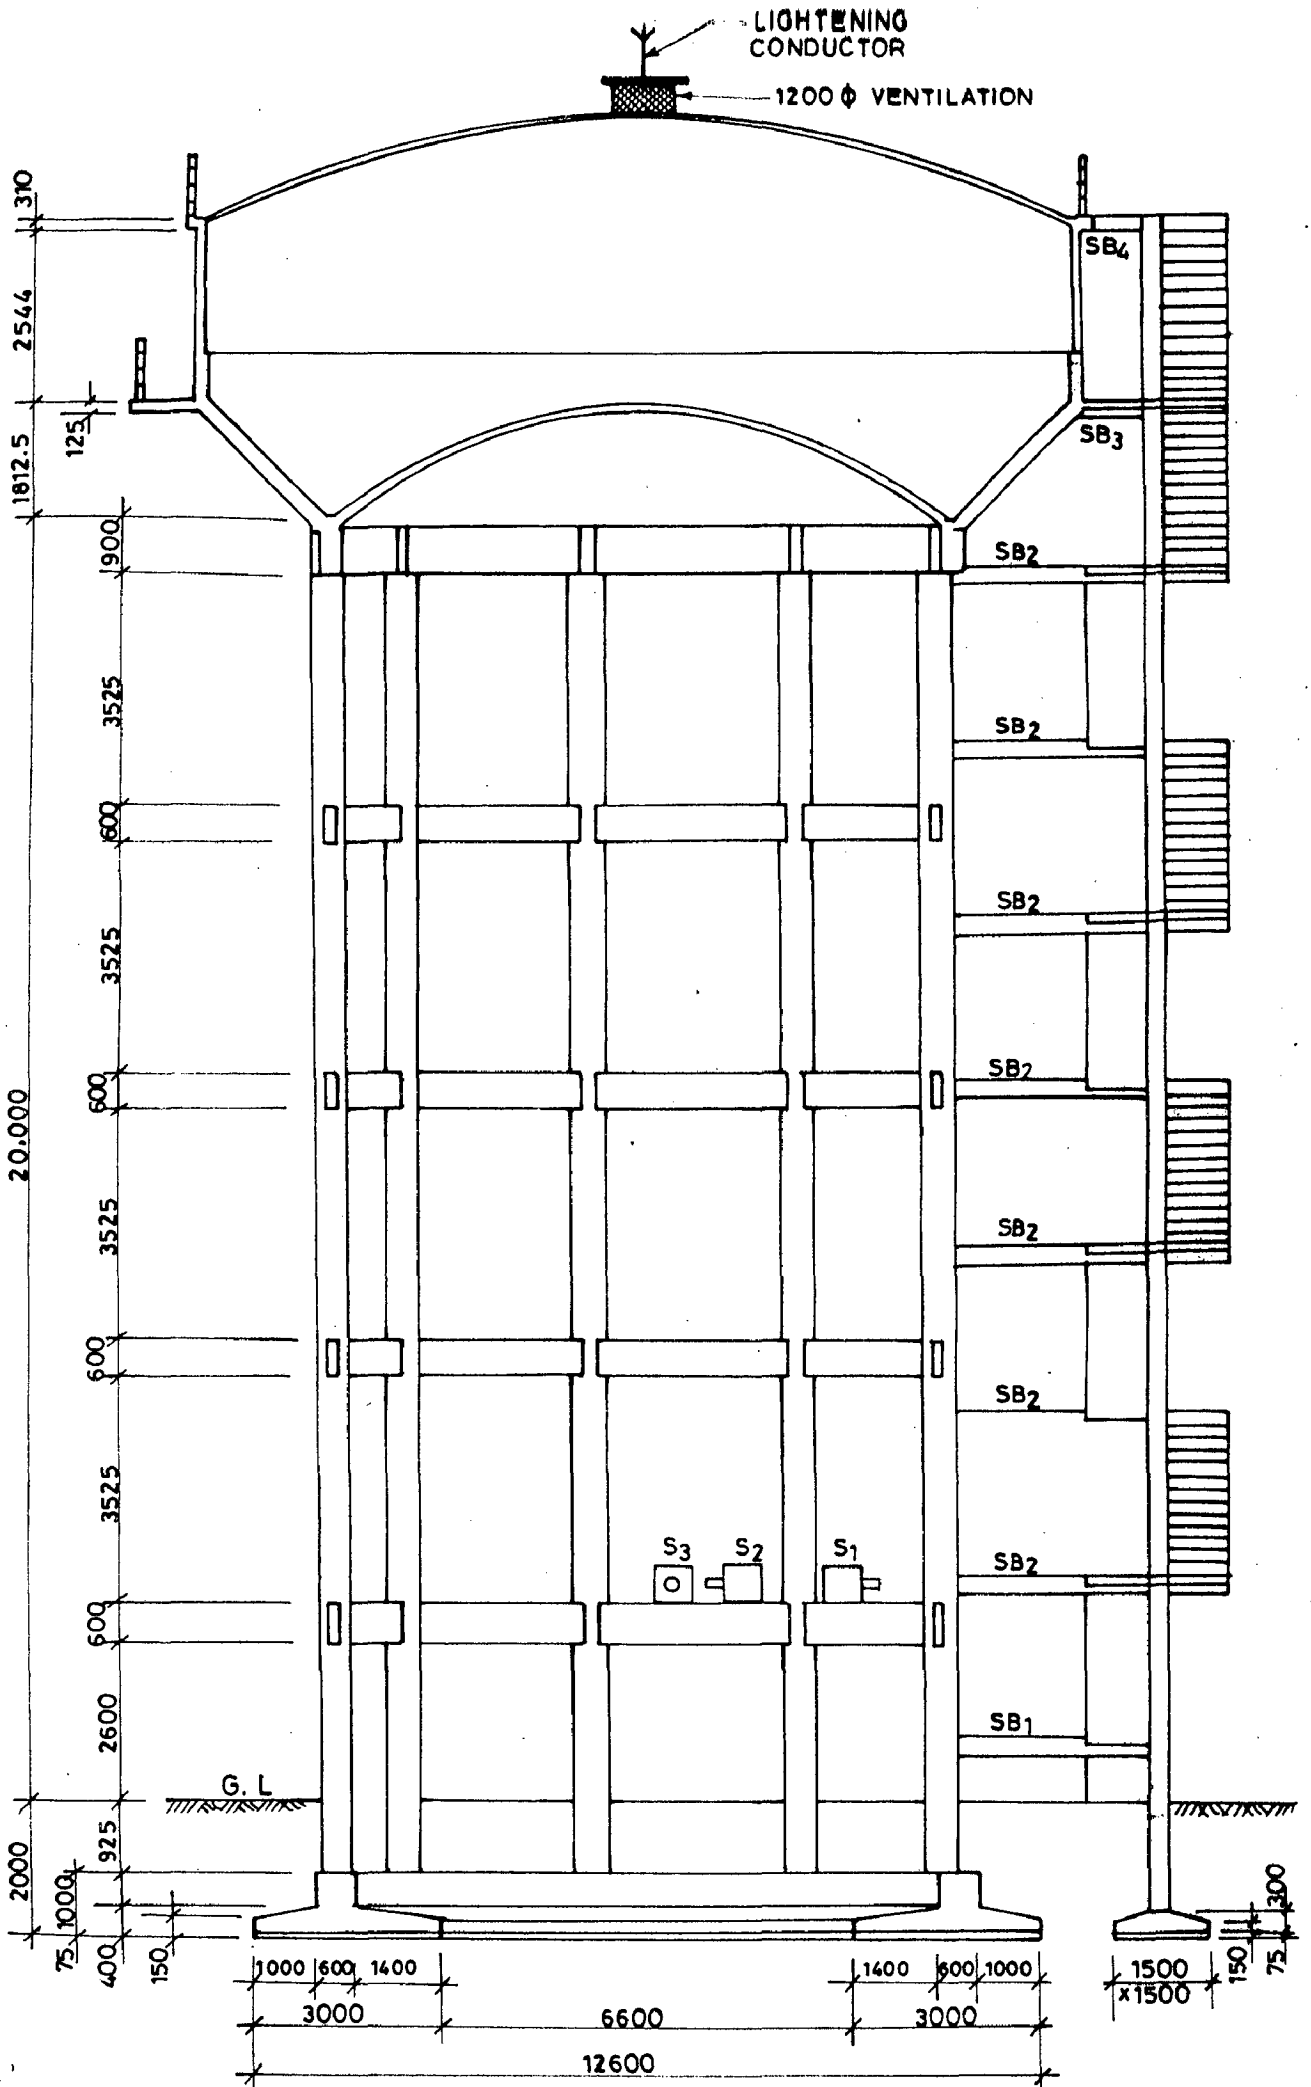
SECTION OF WATER TOWER NEAR SAROJINI BHAWAN
